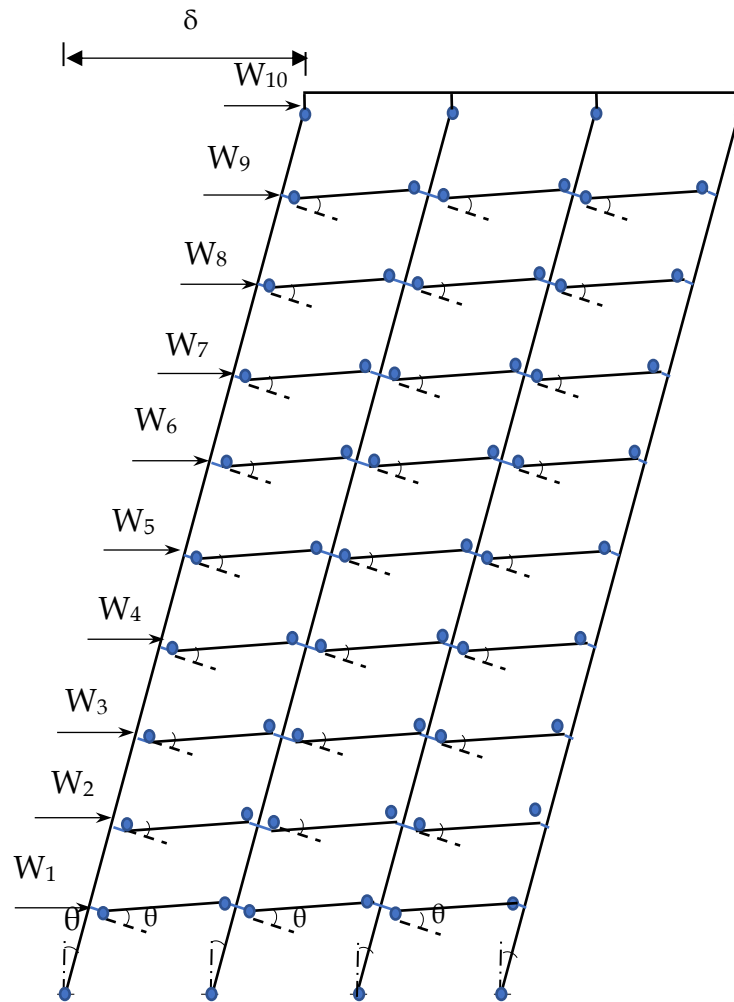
Desirable Mechanism for ten Storey Building.
